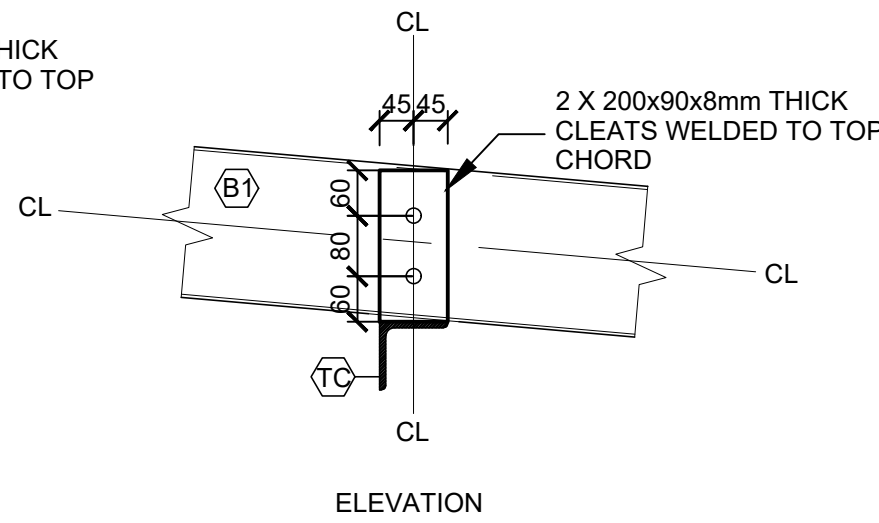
DETAIL C - PURLIN TO BEAM CONNECTION DETAIL
